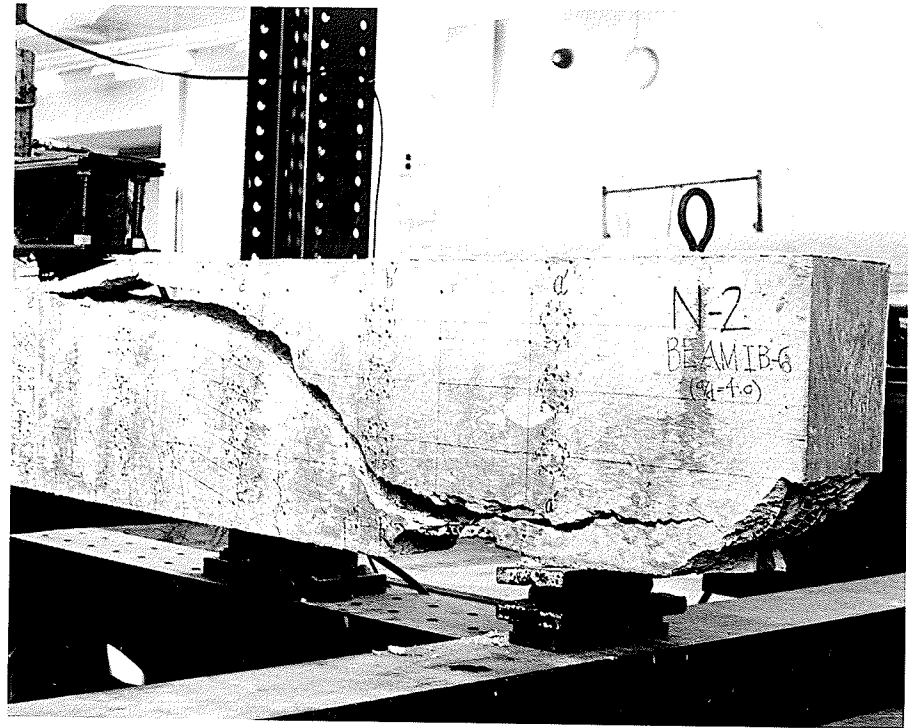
DIAGONAL TENSION FAILURE OF BEAM IB-6
